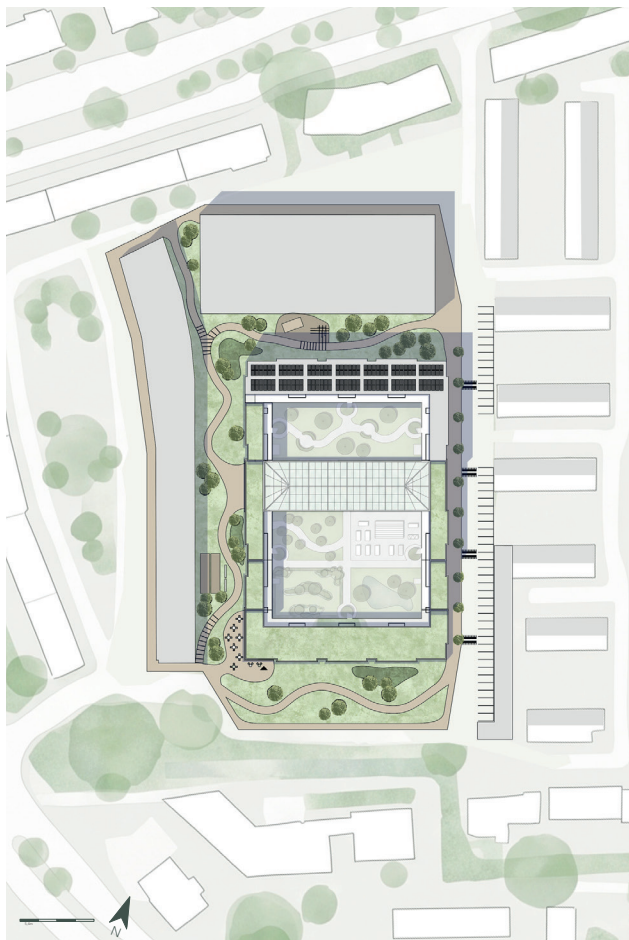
Situation Plan (NTS: adapted from 1:1000 original)
